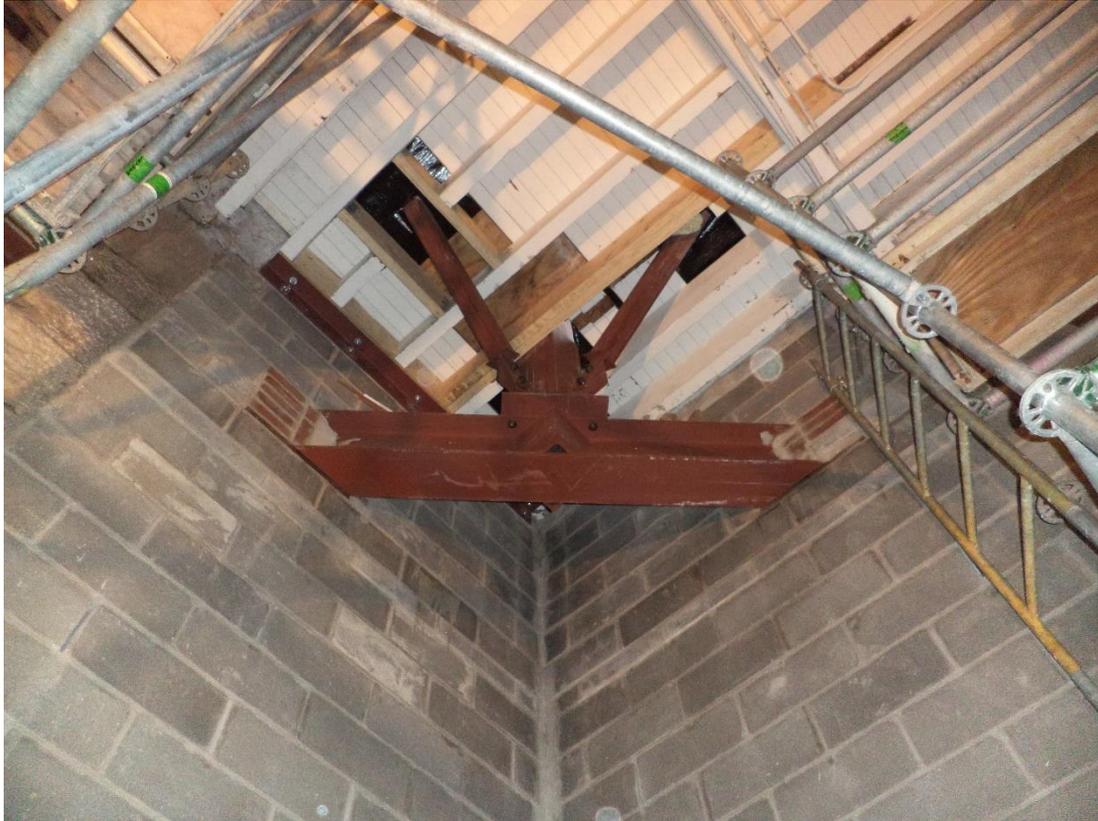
Internal Masonry Shear Wall for Steel Frame. (Keast & Hood 2013, with permission from Keast & Hood)
